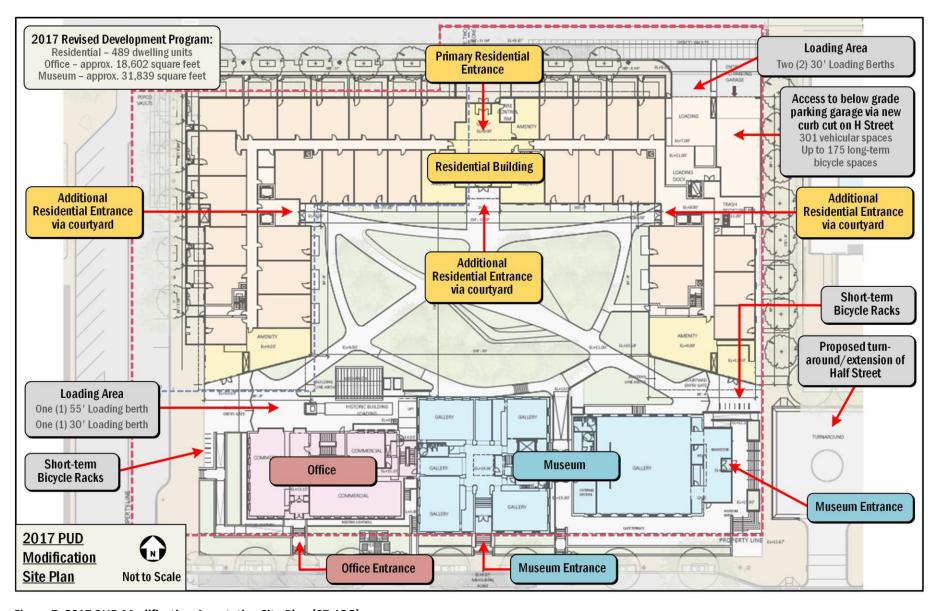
2017 PUD Modification Annotative Site Plan (07-13G)
